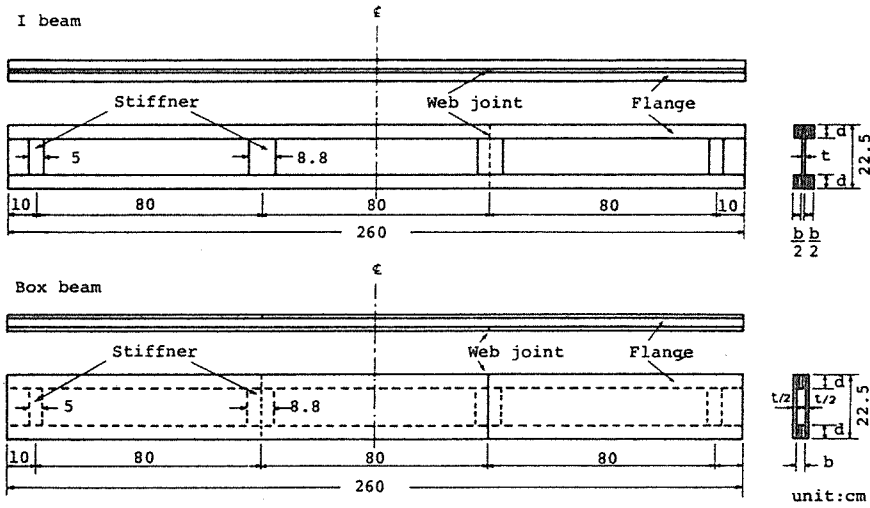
Construction details of I beam and box beam with LVL flanges and plywood webs.
